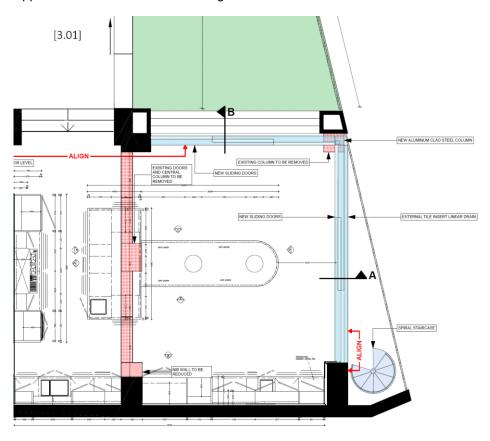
Floor plan detailing the proposed staircase in blue (Source: RCD Projects)
